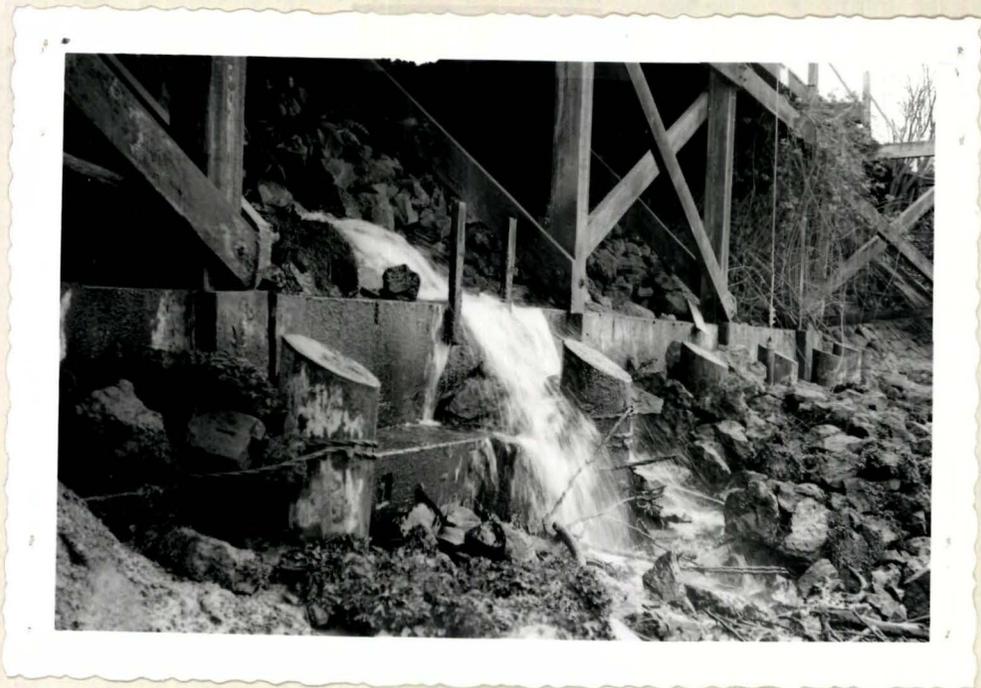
Treated timber sheet piling at outfall for storm and sanitary sewer as seen from Sta. 27+50 looking westerly.
